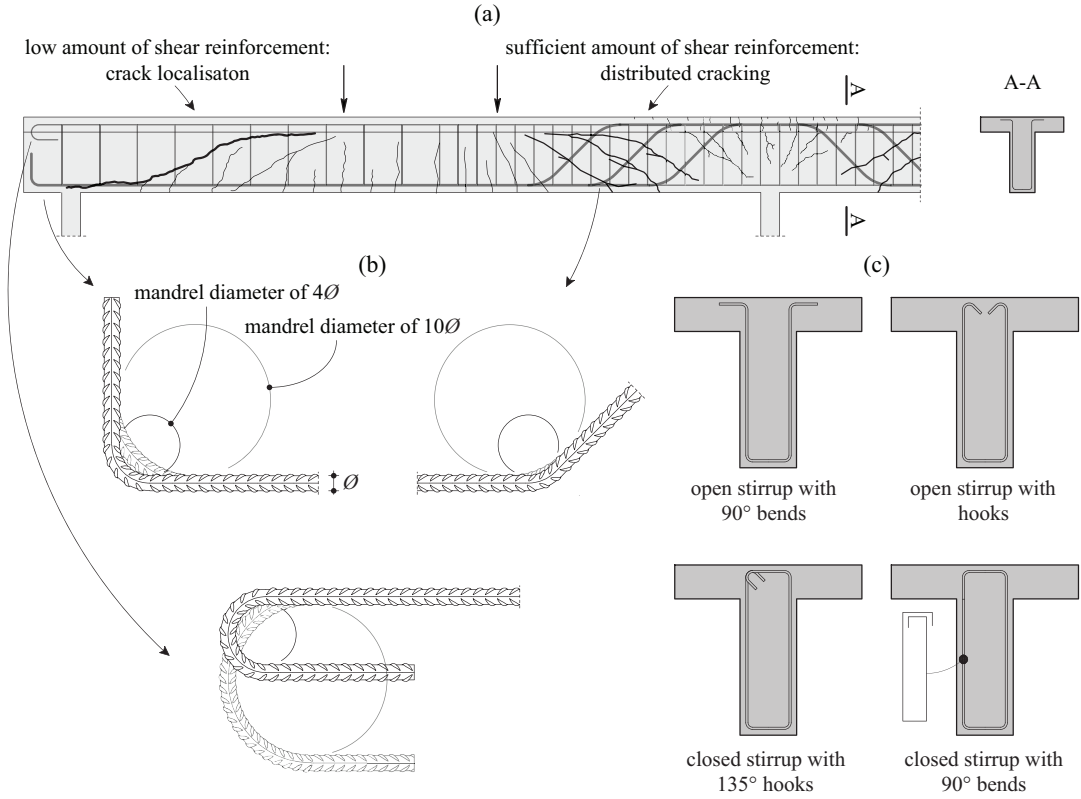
Some detailing rules concerning reinforcement: (a) minimum shear reinforcement ratio; (b) bend detailing and required mandrel diameter; and (c) anchorage of shear reinforcement with bends and hooks
